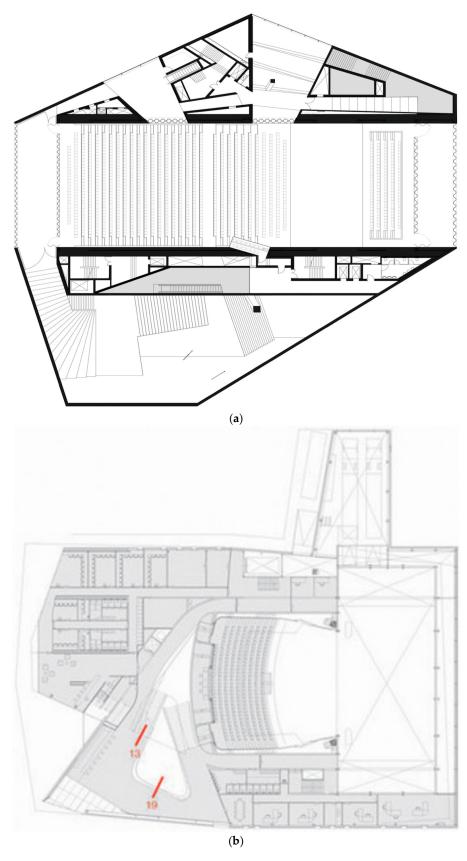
Comparison of the floor plans of both buildings (a) *Casa da Musica* ground floor plan. ©OMA. (b) *Agora Theatre* ground floor plan. ©UNStudio.
